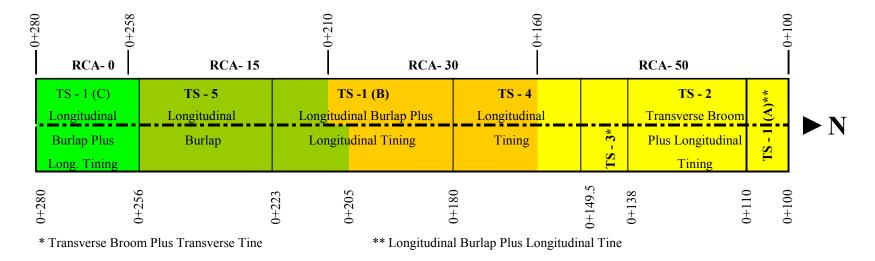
As-Built Textures at CPATT Test Track, Waterloo Landfill Site
